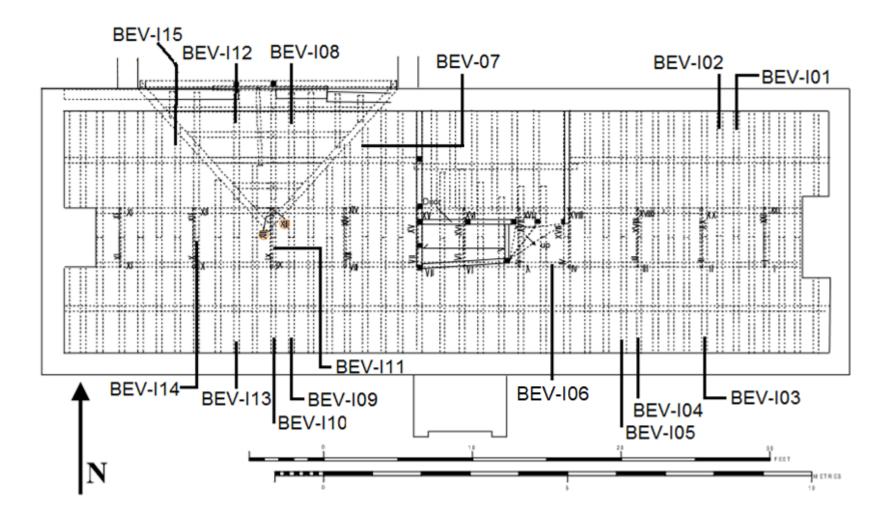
Plan at attic level, showing the location of samples BEV-I01–15 (after YVBSG 2009)
